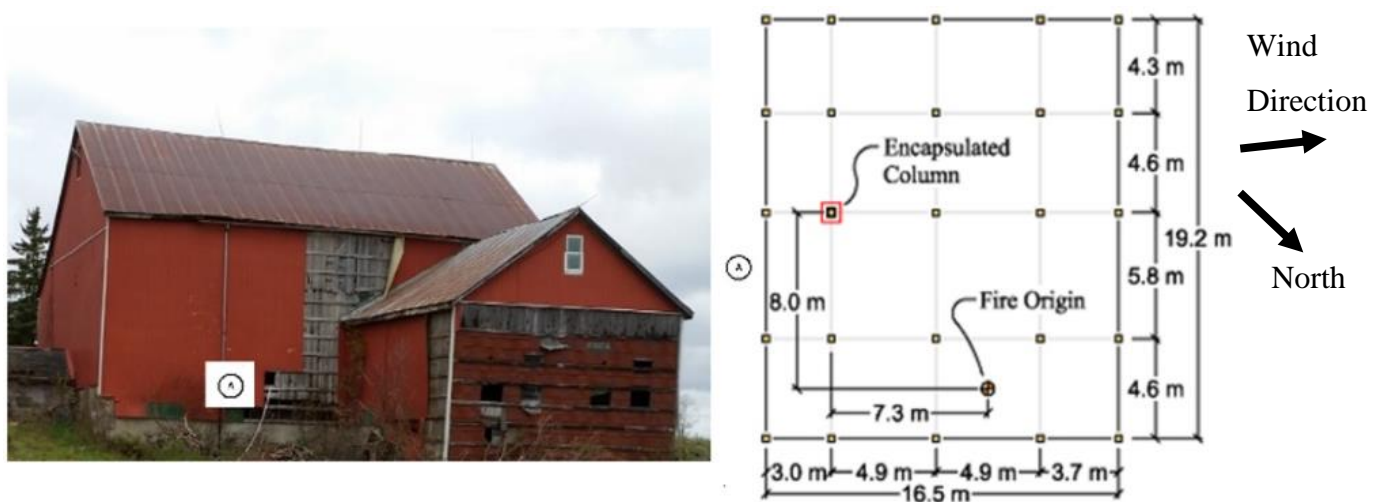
Backside of timber farm structure (left), and atrium dimensions (right- annexes not rendered).
